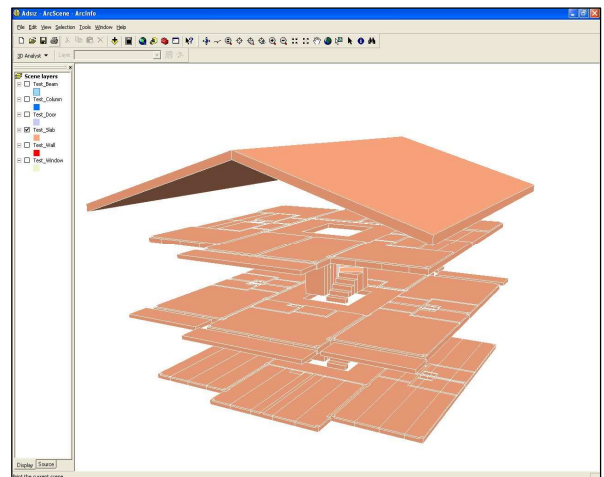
Roof and building from BIM (IFC) models (from Isikdag, 2008)
